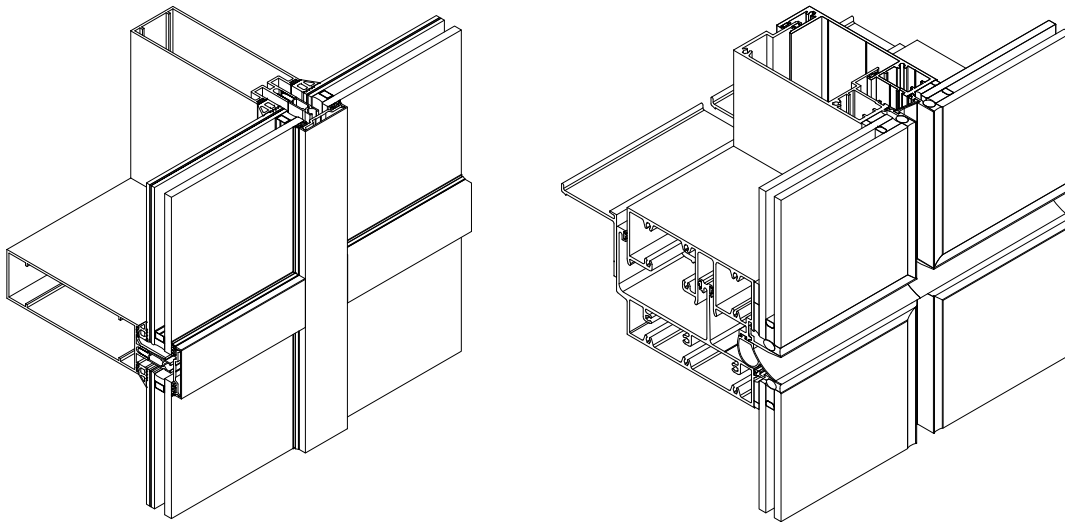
The box mullion and box transom in stick curtain wall (left) and the split mullion and stack joint of a unitised curtain wall (right).
